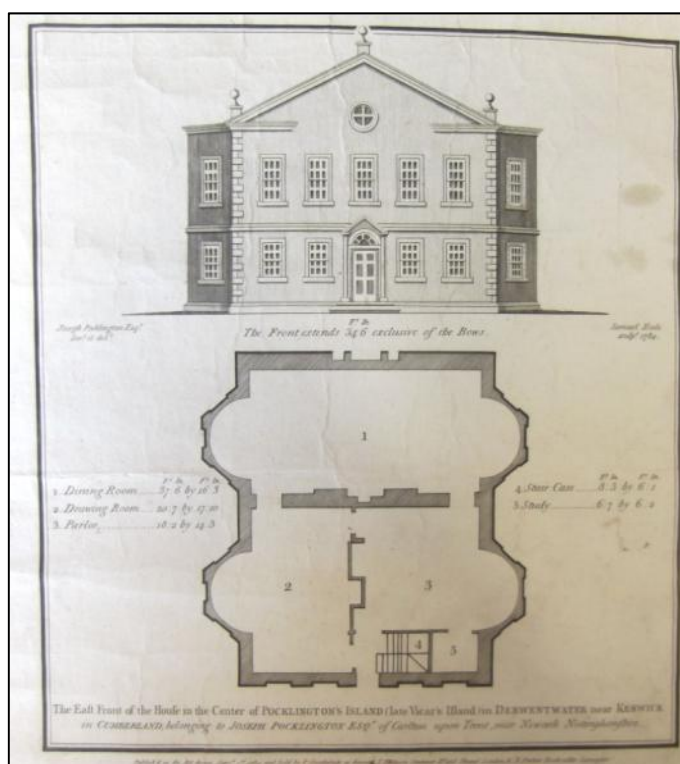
The East Front of the House and Ground Floor Plan (CAC(C) DX774/10/1)
